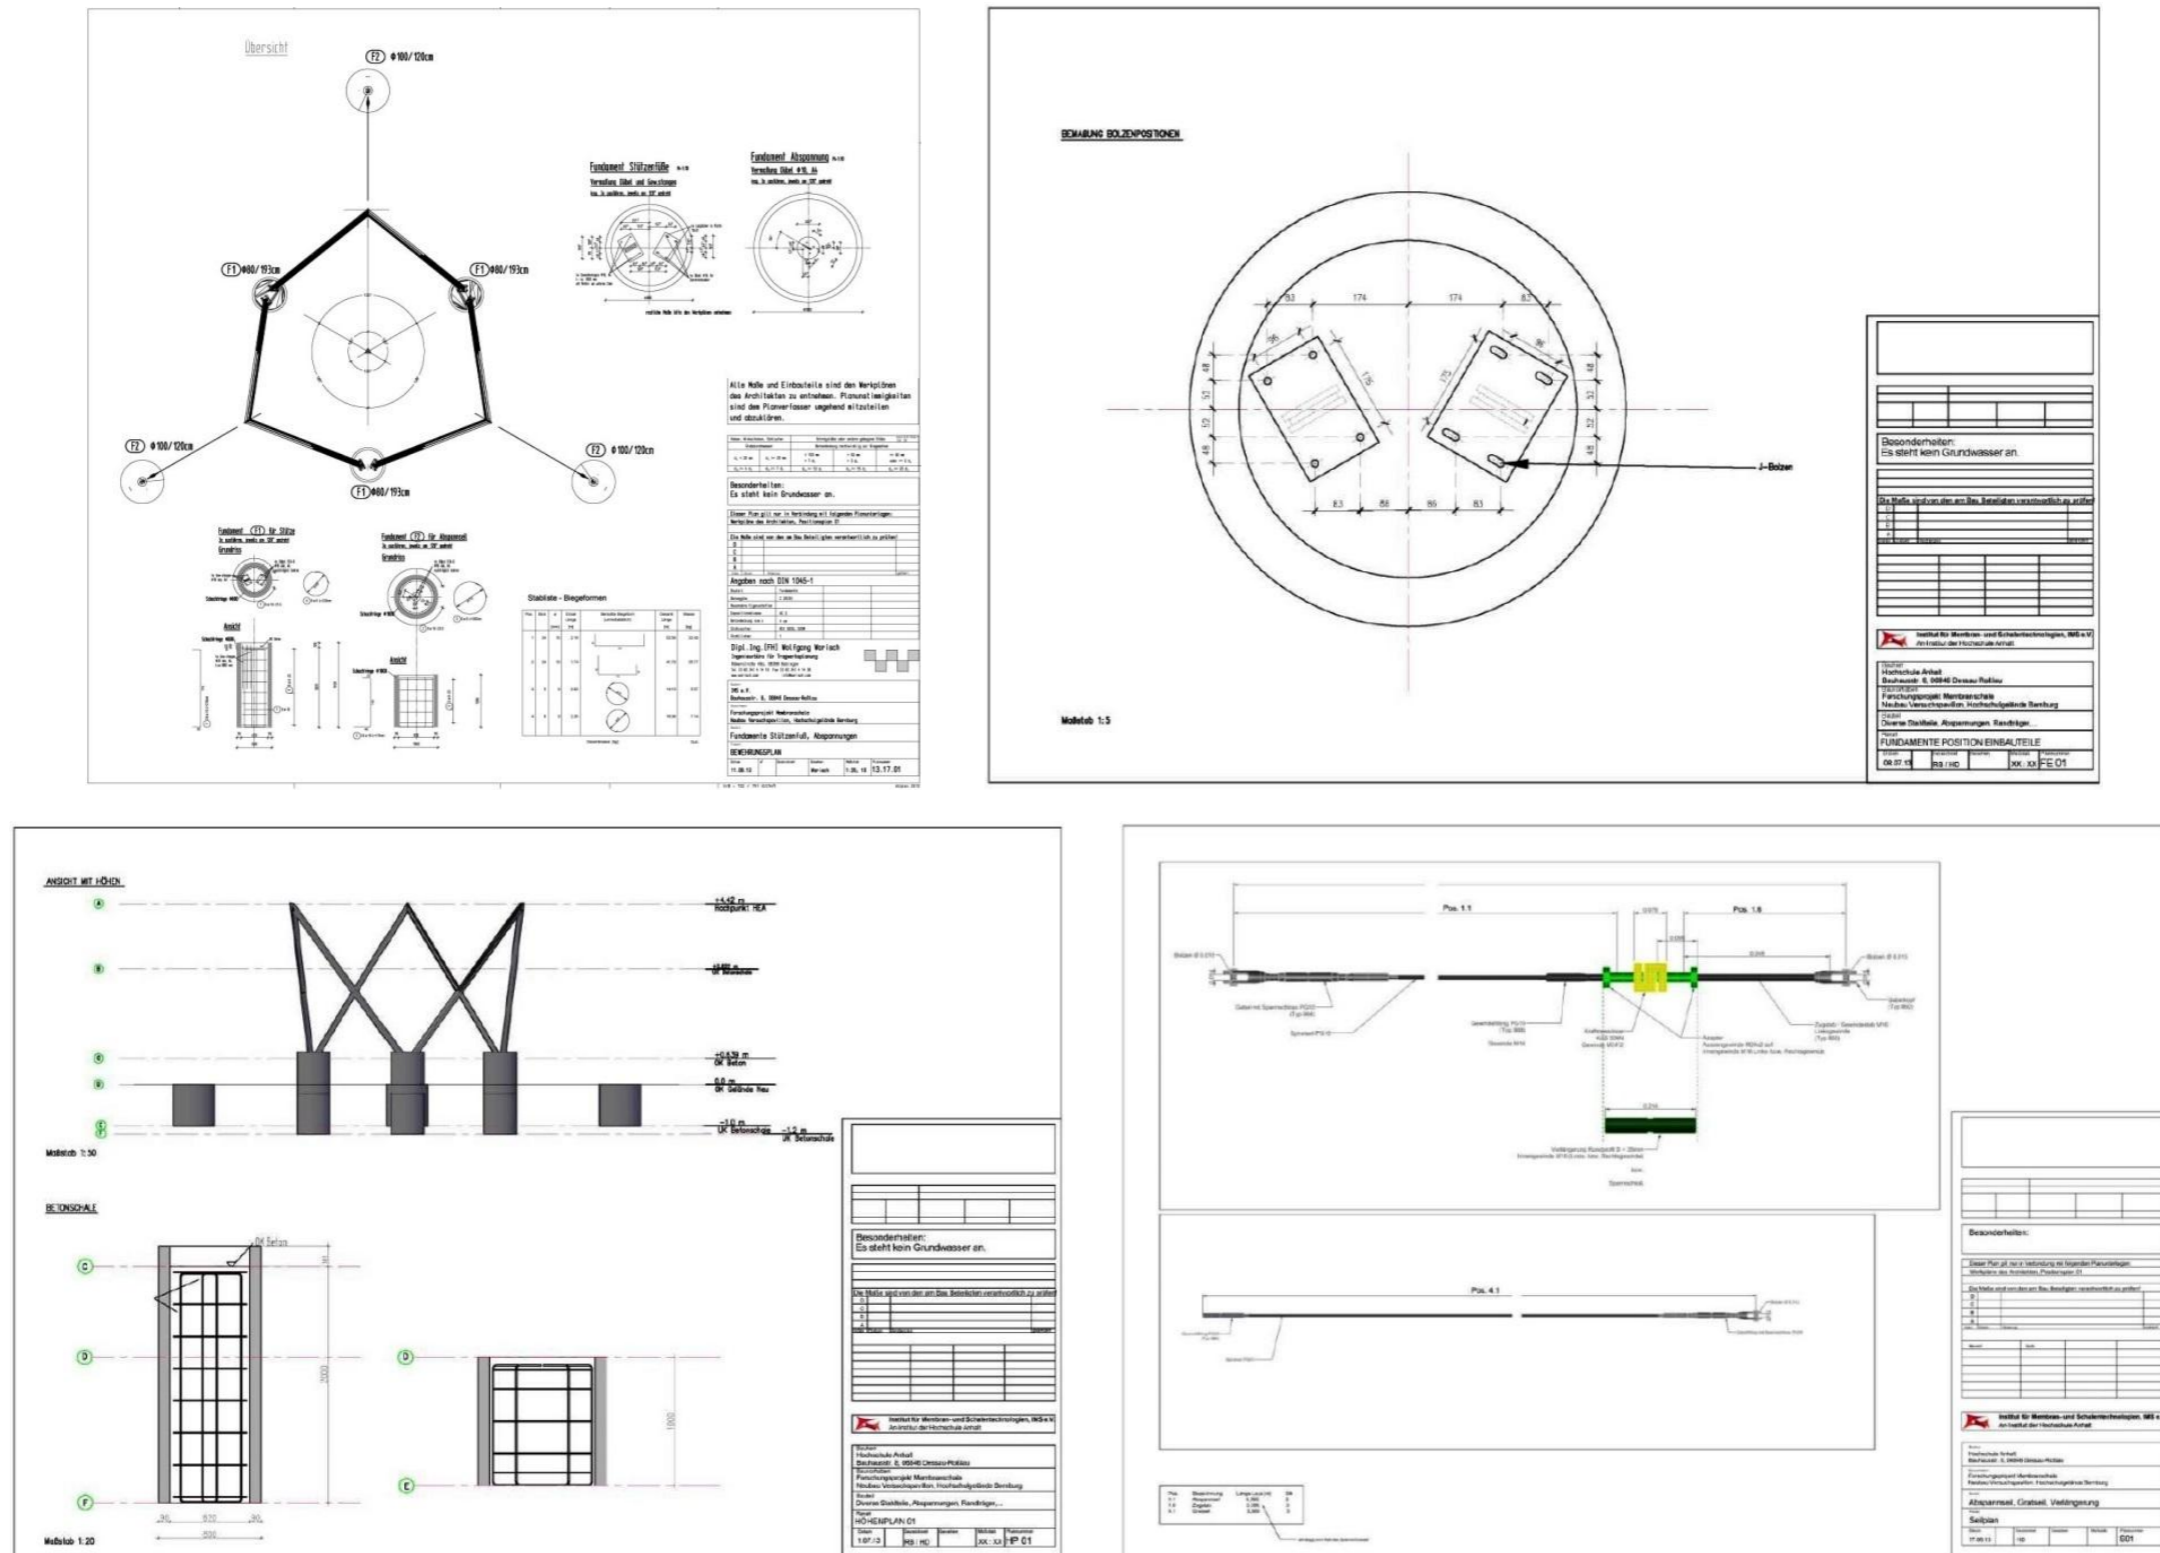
Plan Layout of Concrete Footings, Elevations, Base Plates with Anchor Bolts, Rebar Details and Cables.
